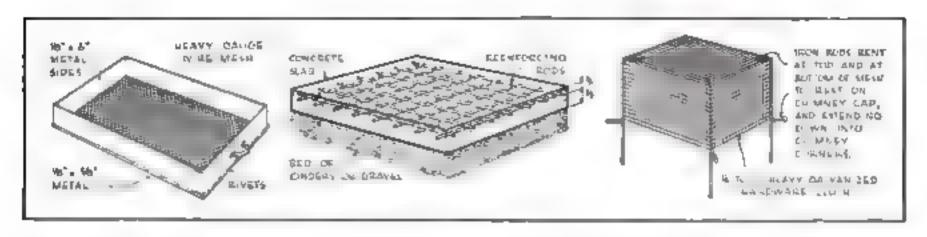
How to build a charcoal pon is shown at the left. Concrete foundations prevent settling and cracking of masonry. Make spork arresters of iron rod and galvanized hardware cloth, as at the right
